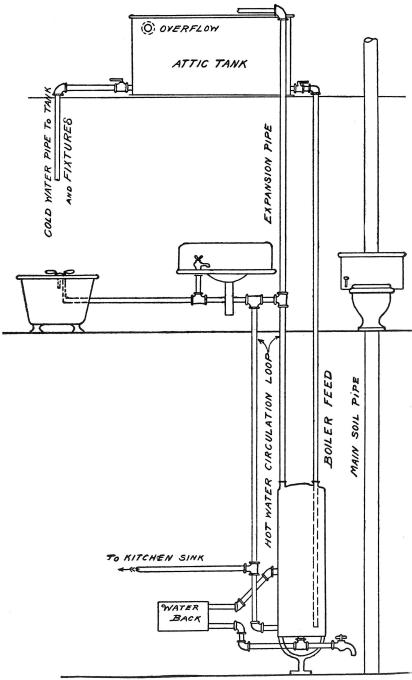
ARRANGEMENT OF HOT WATER PIPING.
